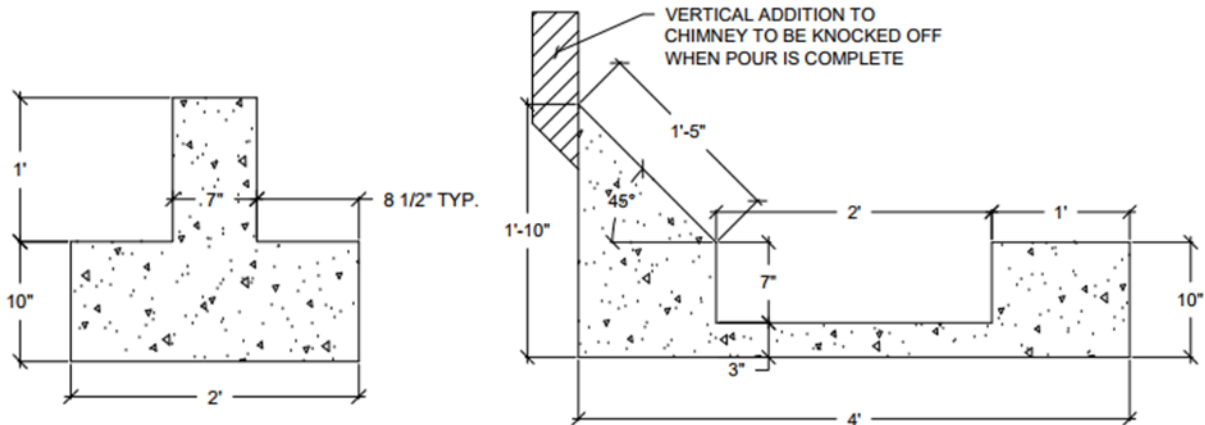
UHPC-Flowability test setup design “chimney” cross section.
